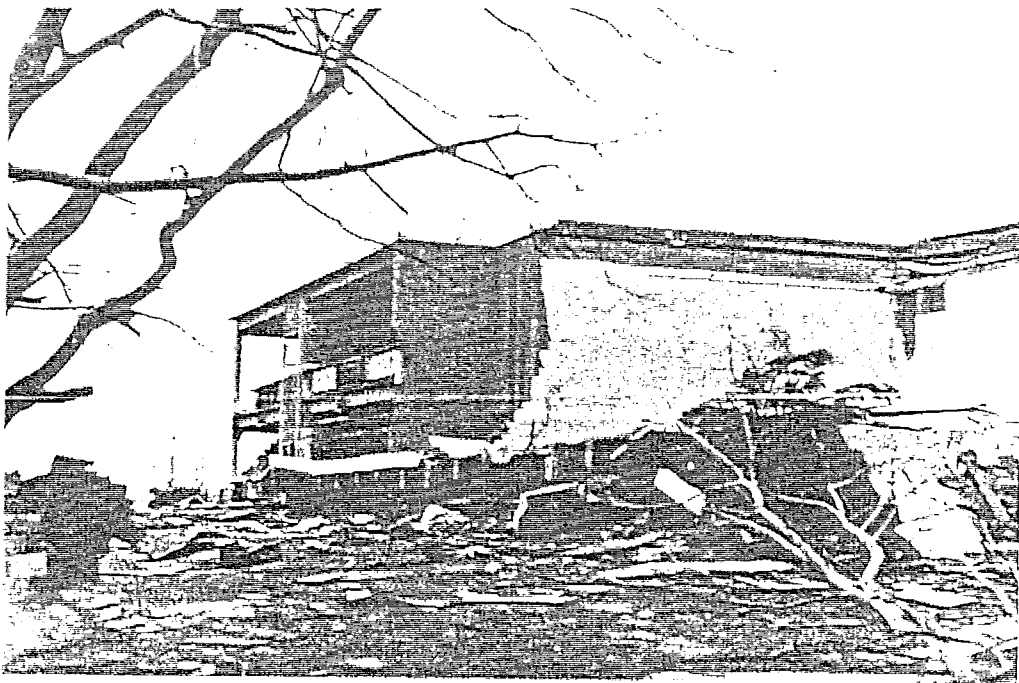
XENIA HIGH SCHOOL GYMNASIUM. The precast concrete roof of the gymnasium (foreground) collapsed when the loadbearing walls failed. In the background, precast concrete framing survived, but wall panels are gone.
